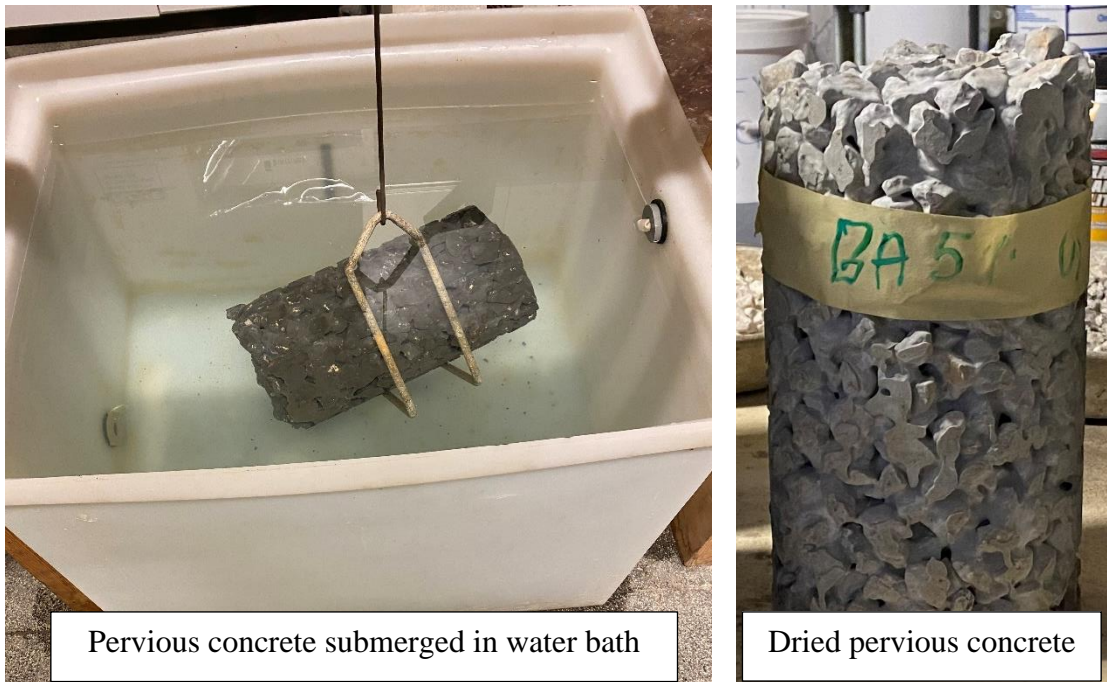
Pervious concrete containing 5% BA submerged in a water bath for 30 minutes and then dried in an oven for the air voids content test
